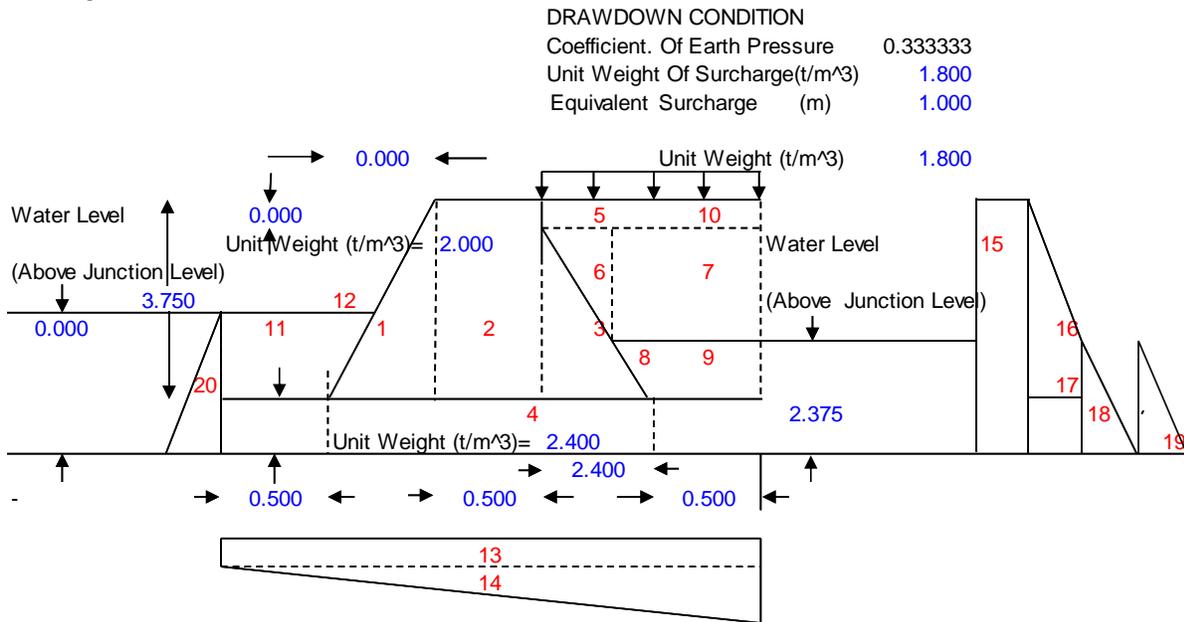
Stability analyses for D/S Retaining walls at Foundation level
